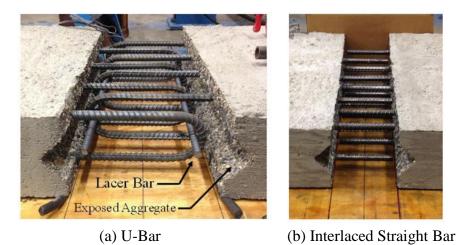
Sample Closure Connection Details (Haber et al. 2016)
